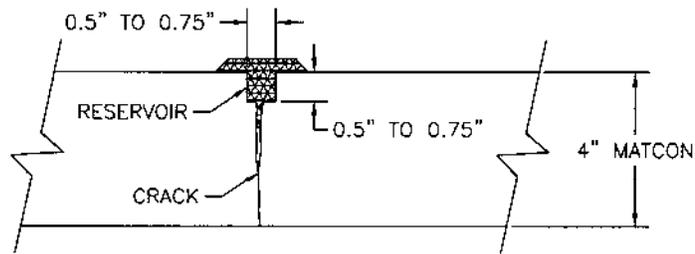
CROSS SECTION OF CRACK SEALING GENERALLY CALLED A STANDARD RECESSED BAND-AID
